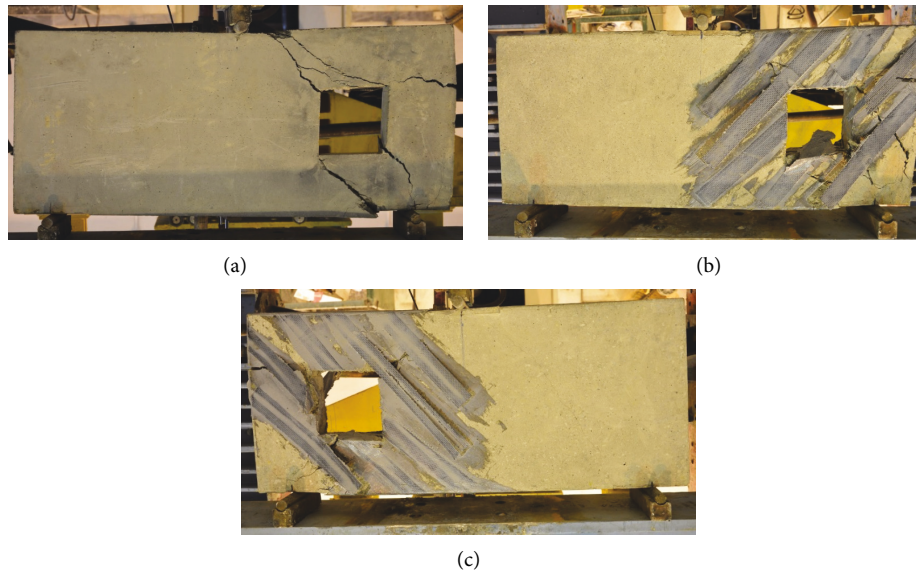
Failure modes of specimens with asymmetrically positioned openings: (a) specimen *E*, (b) specimen *E-EBR*, and (c) specimen *E-EBROG*.
